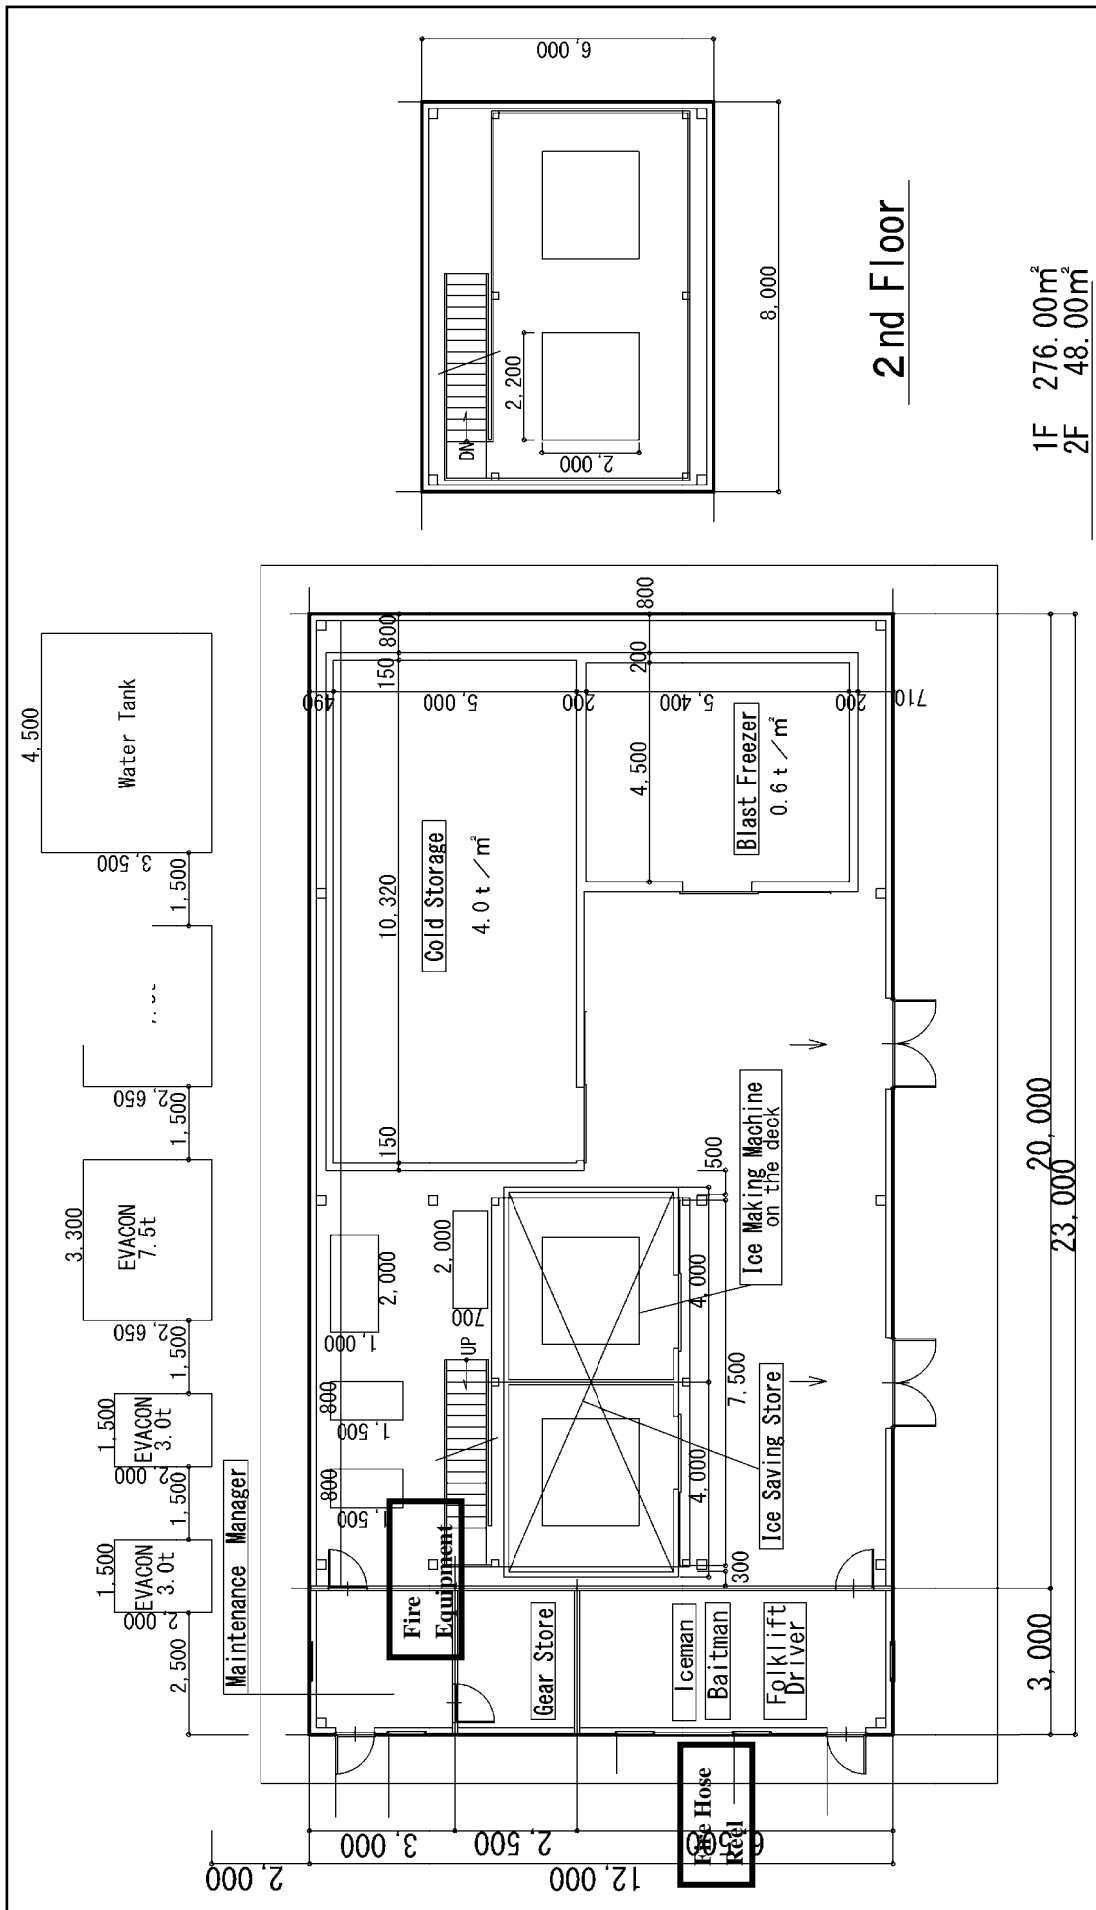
(3) Location of Fire-Extinguishing Equipment (Ice Plant at Providence)
